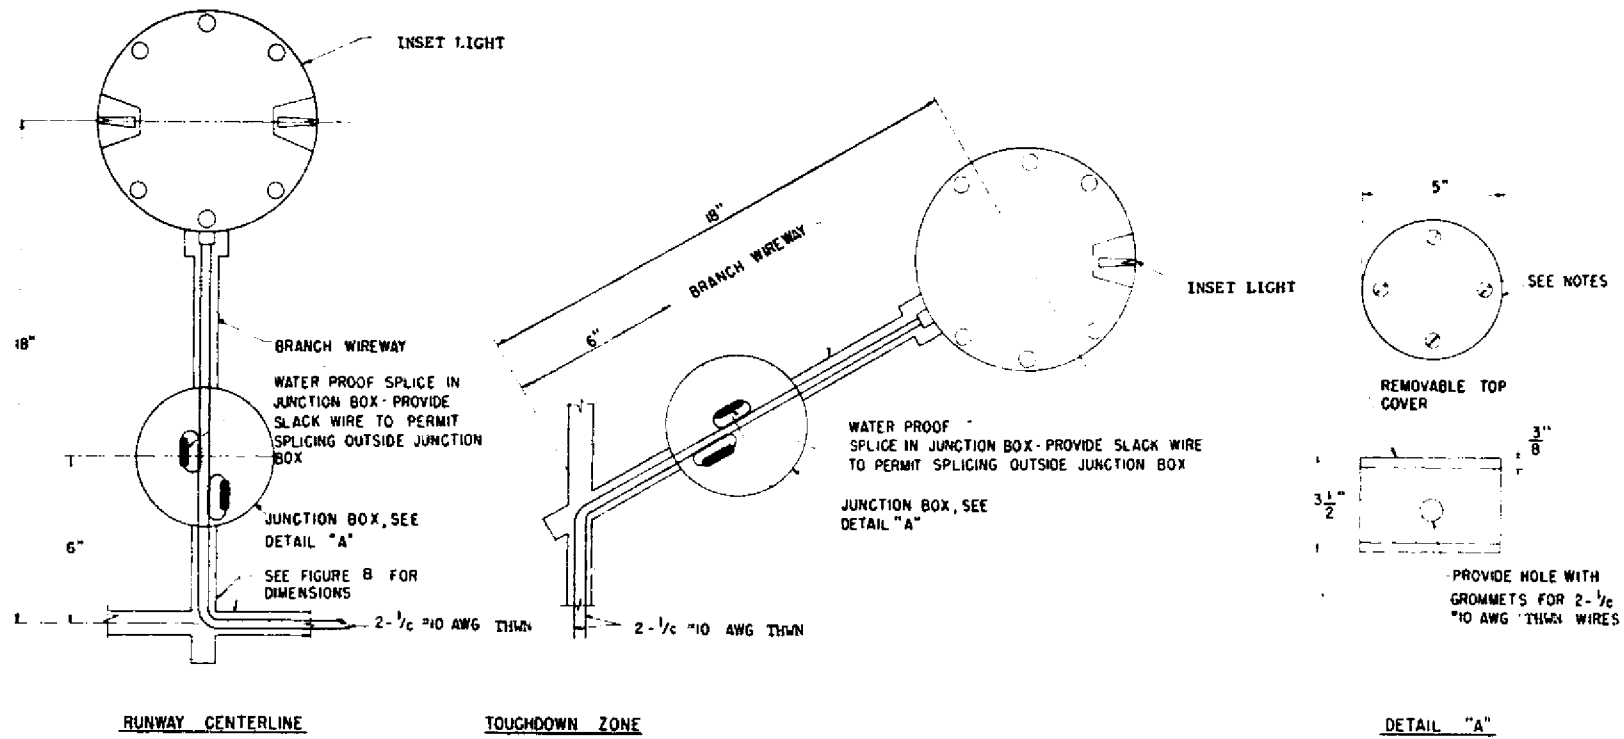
TYPICAL EQUIPMENT LAYOUT, INSET TYPE LIGHTING FIXTURES
